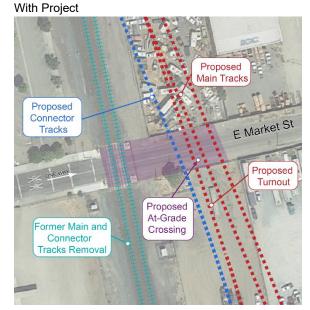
Existing and Proposed Track Configuration (East Weber Avenue to South of East Church Street) - Sheet 2 of 3
